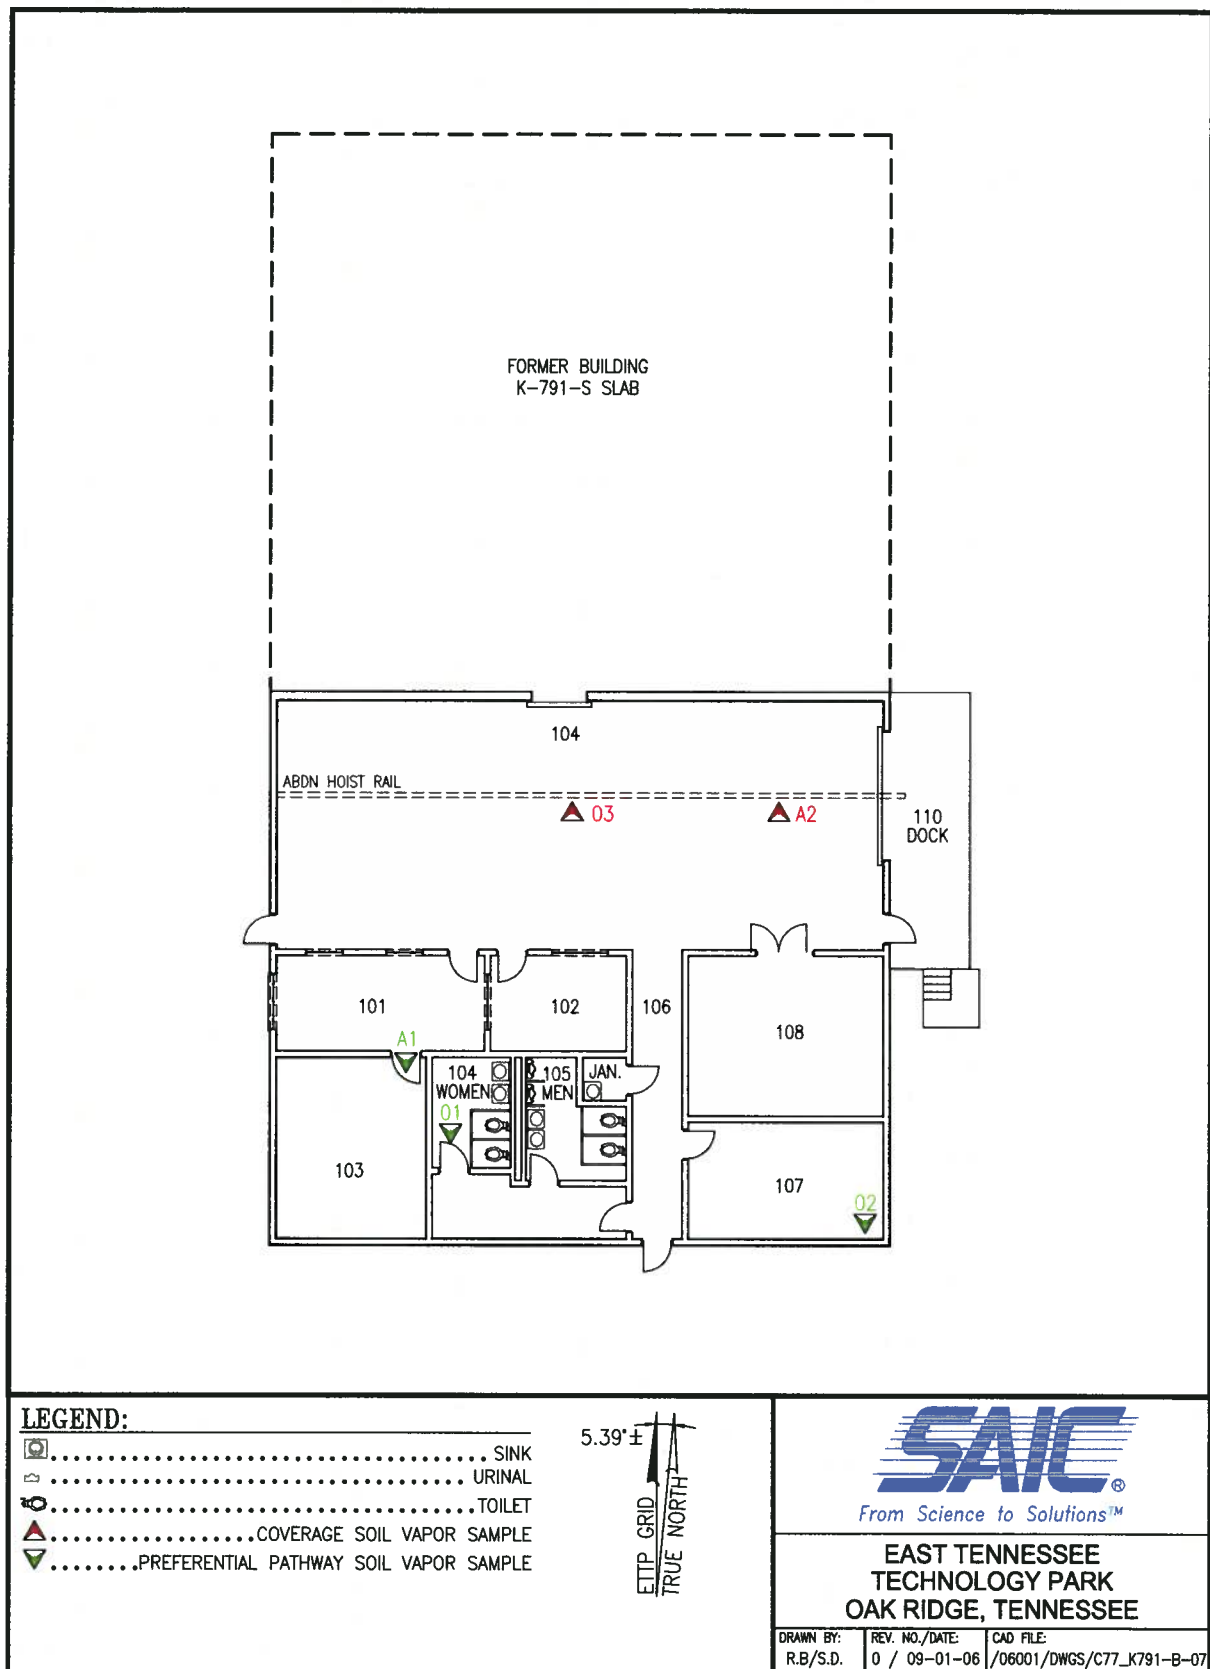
Building K-791-B soil vapor sample locations.
